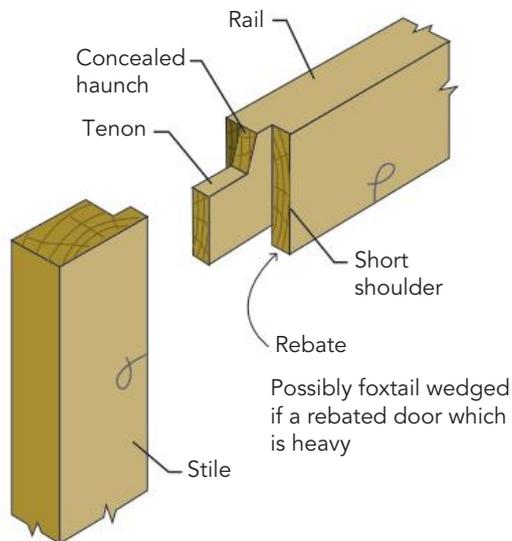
Long- and short-shouldered mortise and tenon joint, with rebate
